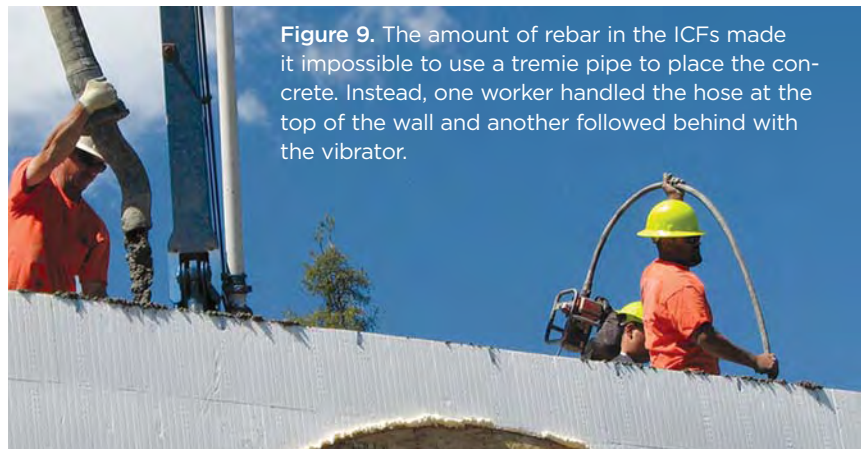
The amount of rebar in the ICFs made it impossible to use a tremie pipe to place the concrete. Instead, one worker handled the hose at the top of the wall and another followed behind with the vibrator.
